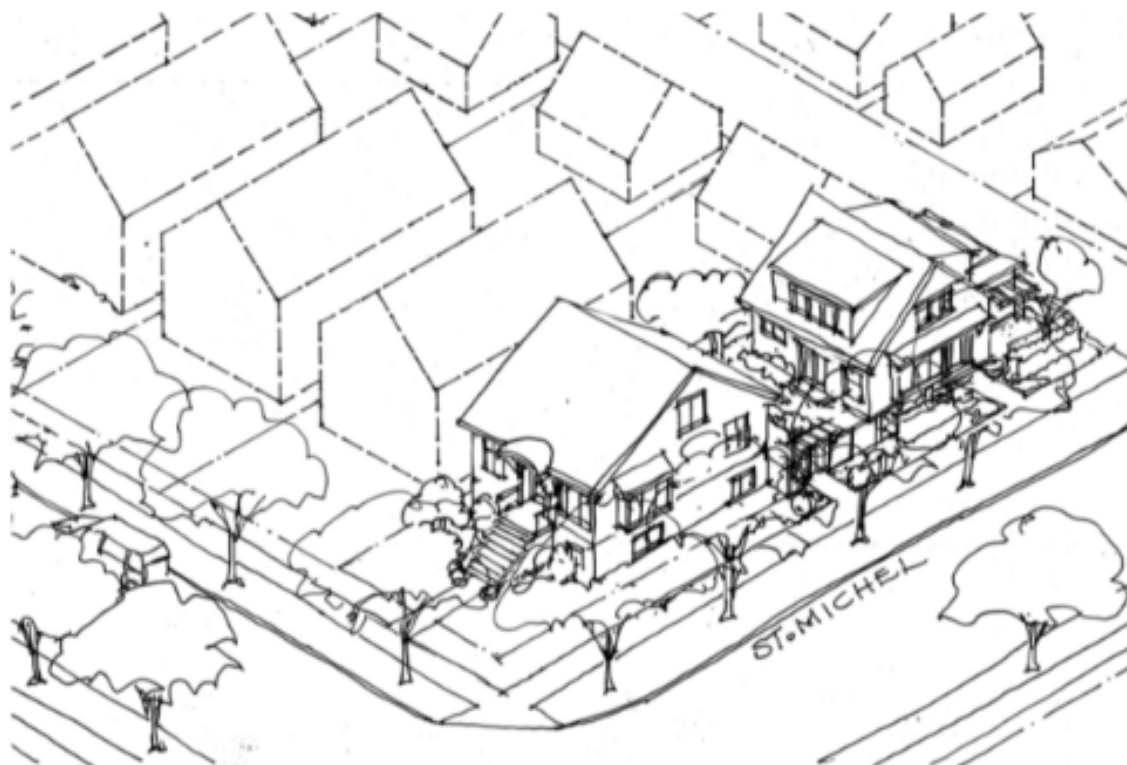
Example of Detached Duplex Dwelling Unit on a corner lot.
